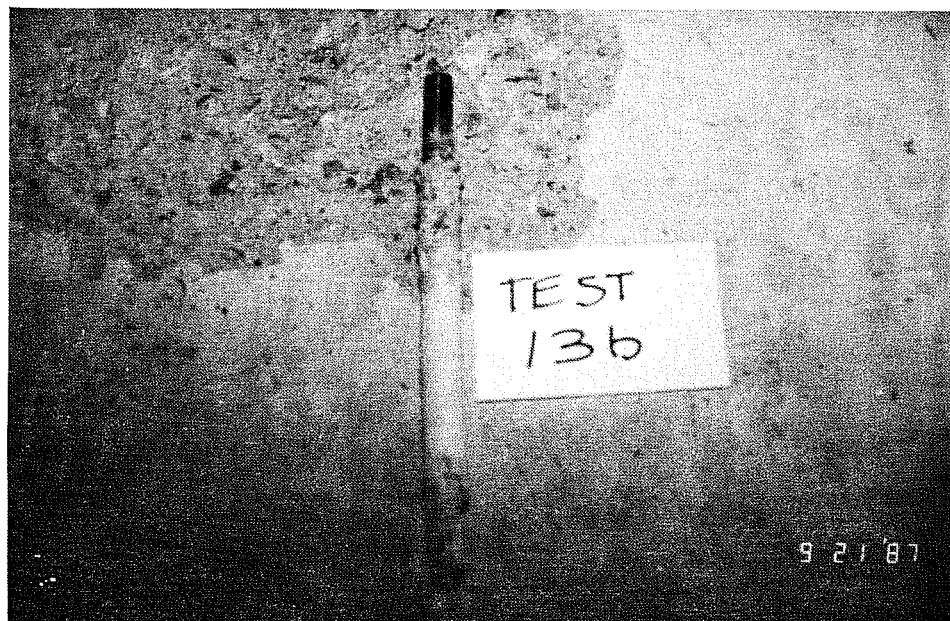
Adhesive Anchor Failing in the Bond Between the Adhesive and Concrete
